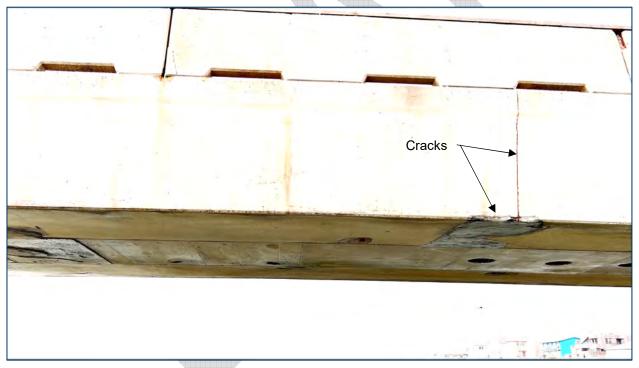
Deck Exterior between Bent 1D and 1C – South Face
